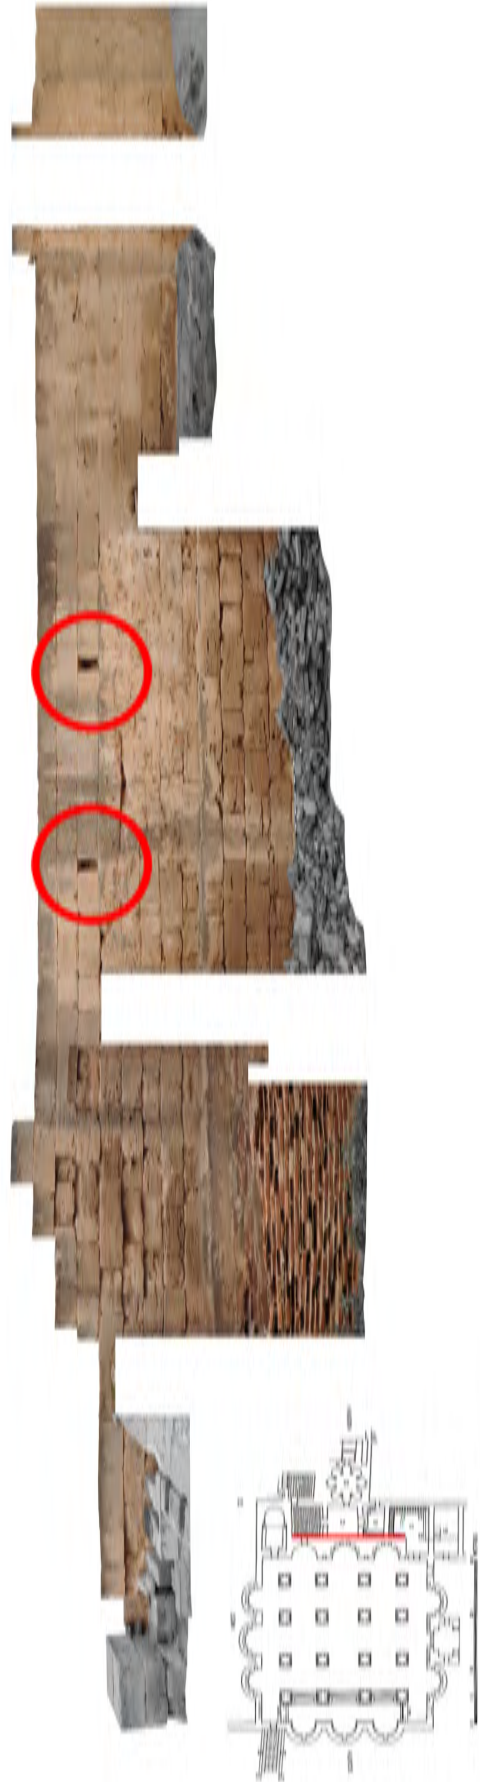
, Audience Hall and bath building: elevation of the north wall of the Audience Hall building, looking north toward the bathhouse. This straight and flat external elevation (contrasted with the other elevations, which denote the existence of the exedrae) shows the intention to have the bathhouse built against it in a second stage. The fact that it was planned in advance can be also ascertained from two extra features: (1) the flues for the evacuation of smoke from the *hypocaustum* that were built in advance inside the wall (and allowed heating the wall chamber built with *tubuli*, the imprint of which still can be seen, precisely at the height of the mentioned flues); (2) the built-in step in the wall that supports the pipe that brings water to the bathhouse and latrines. Orthorectification by I. Moscoso.
